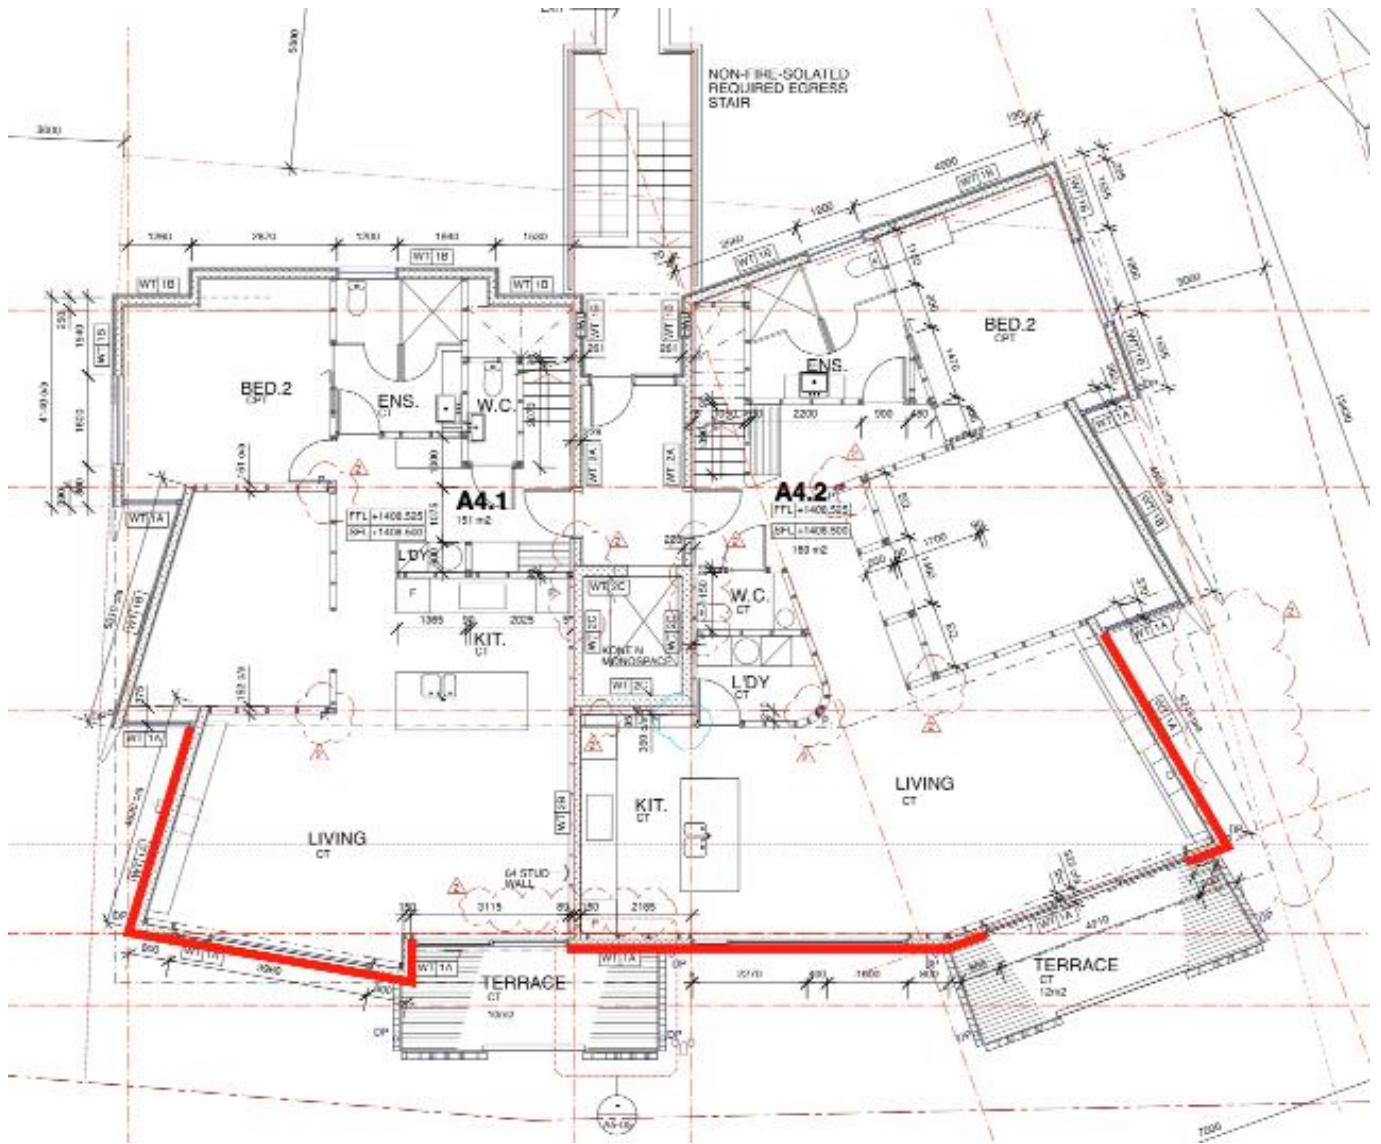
| Floor plan highlighting location of cladding to be replaced (source: Applicant's documentation)
